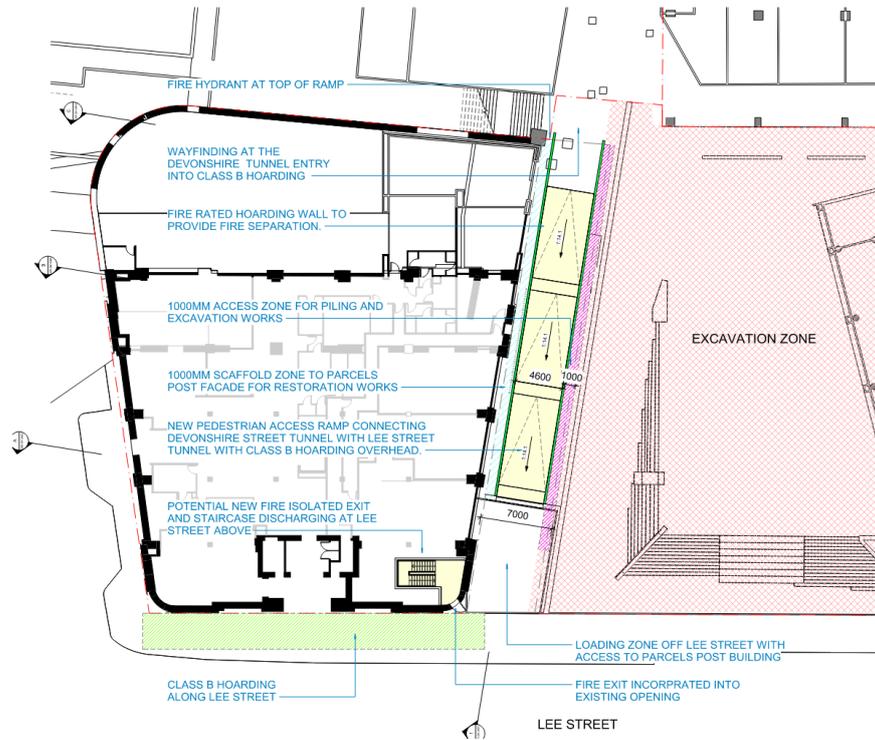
Stage 3 Pedestrian Access during Construction (Concept plan of temporary solution)
